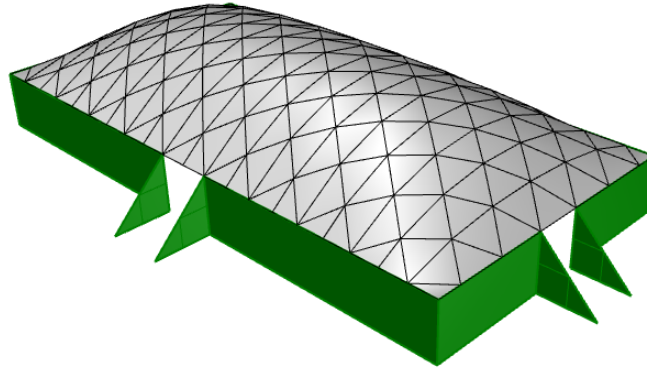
Design Concept 1: Illustration from the architect. Concrete walls and a timber gridshell roof.
